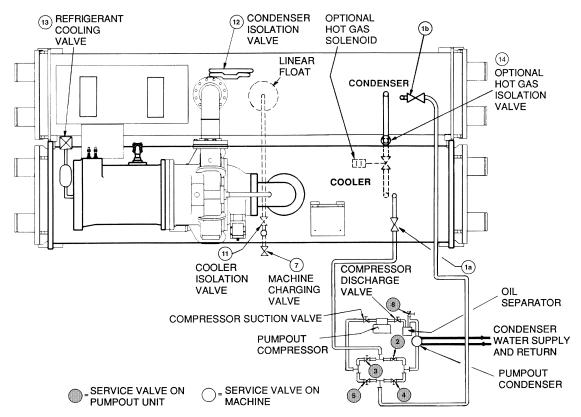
Typical Optional Pumpout System Piping Schematic without Storage Tank
